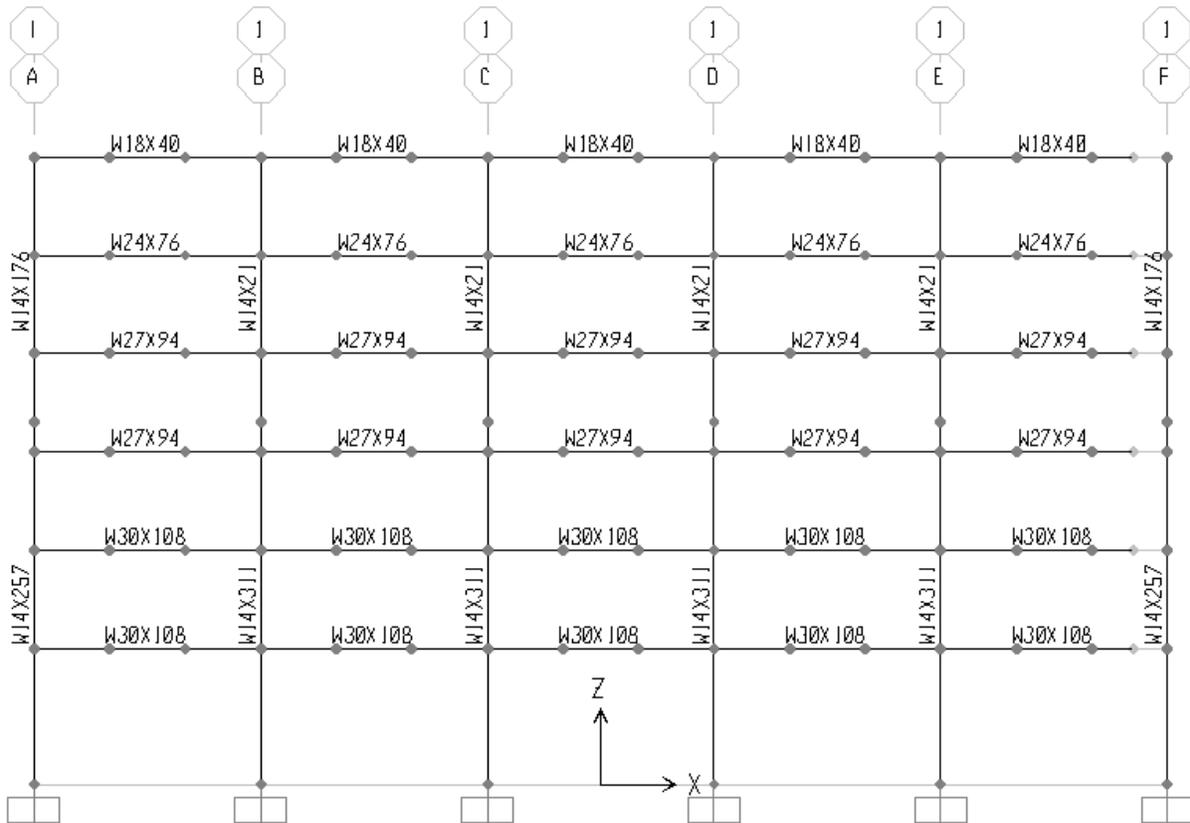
Elevation View of Six-Story Moment Frame as Girder
